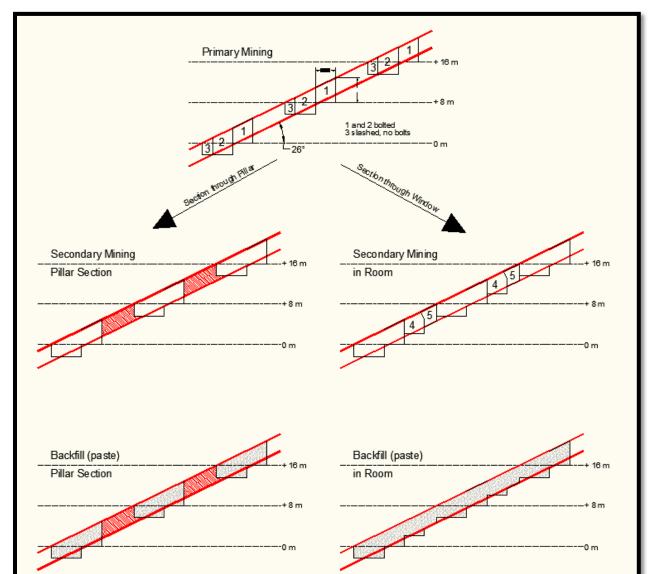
Cross Section of Step Room and Pillar Stope at 3 m True Thickness
